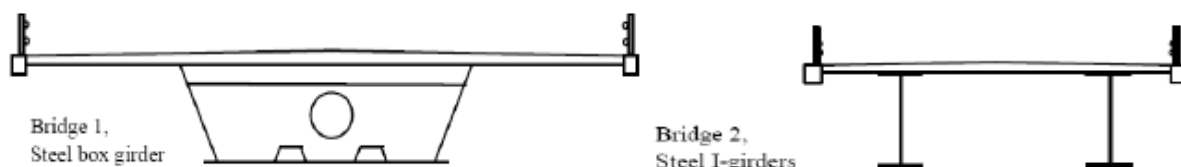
a) Steel box girder bridge and b) steel I-girders bridge (Widman, 1998)
